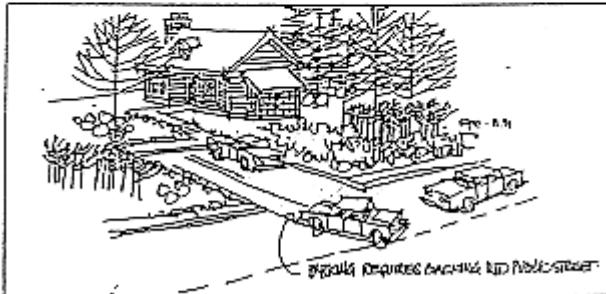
Off-street parking requiring backing onto major roads is discouraged.
